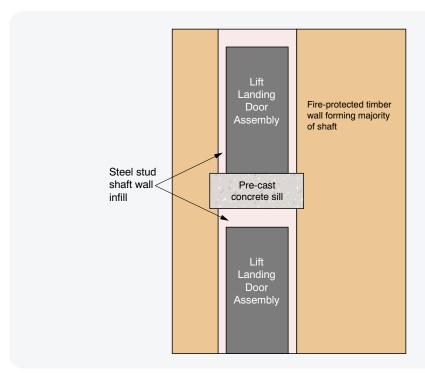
(19): Elevation showing wall transition around lift landing doors.
